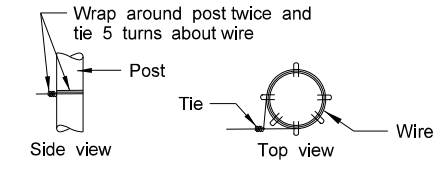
DETAIL FOR TYING FENCE TO WINGS OF ABUTMENTS
